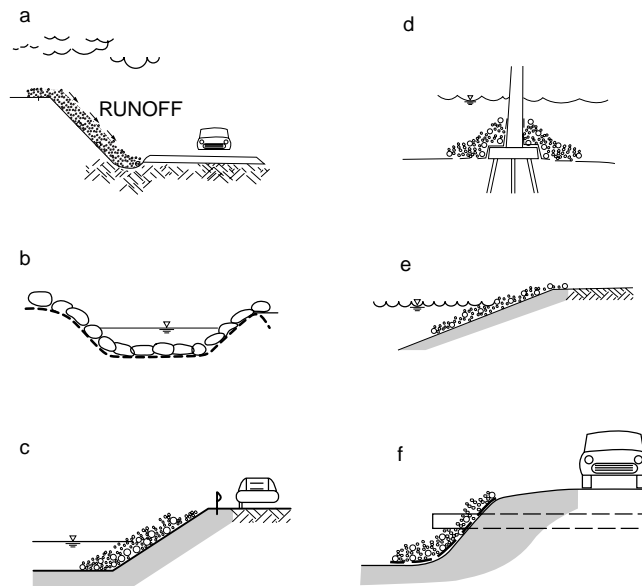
Permanent erosion control applications: (a) slope protection, (b) diversion ditches, (c) stream and canal banks, (d) scour protection, (e) beaches, and (f) culvert outlets. (Source: Christopher, B. R., and Holtz, R. D. 1989, *Geotextile Design and Construction Guidelines*. U.S. Federal Highway Administration, National Highway Institute, Report No. FHWA-HI-90-001.)
